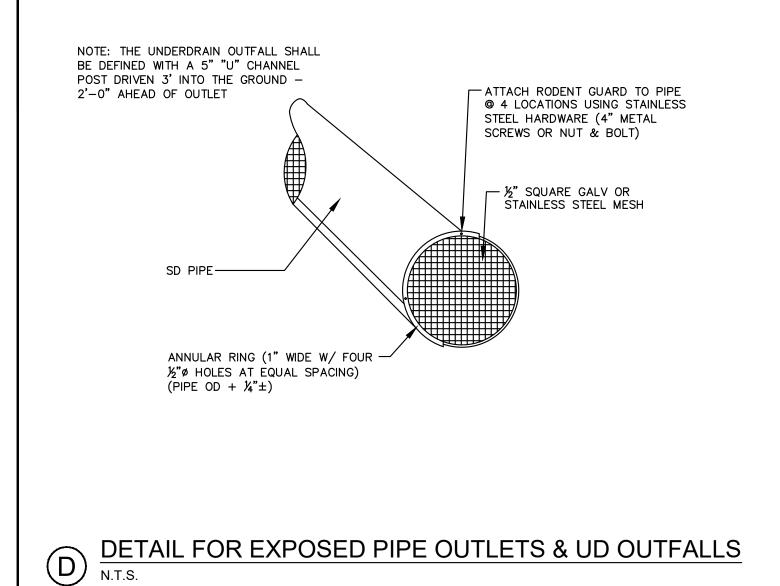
STORMWATER MANAGEMENT PLAN & SECTIONS
